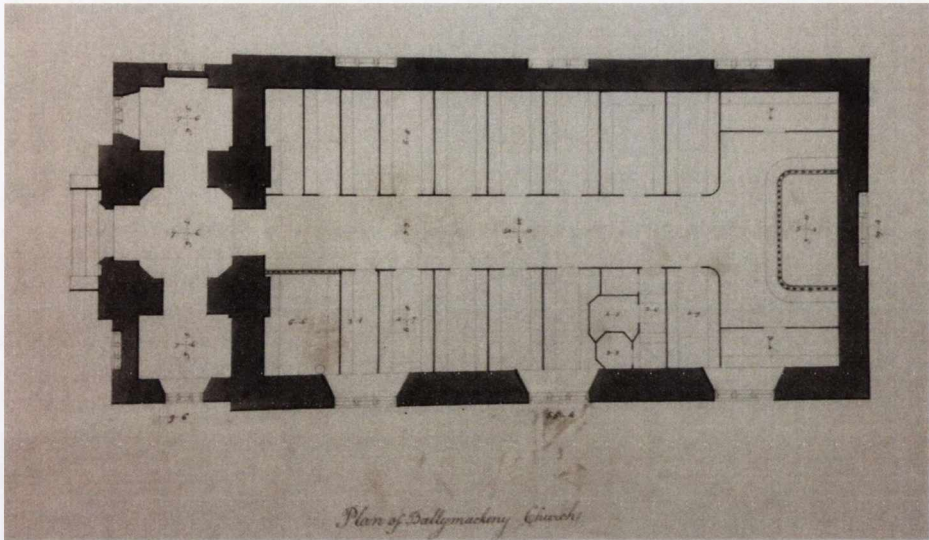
Ballymakenny Church (C of I), Co. Louth, plan, attrib. to Thomas Cooley, n.d., IAA, RIAI Murray Collection, 92/46.102, courtesy of the Irish Architectural Archive.
